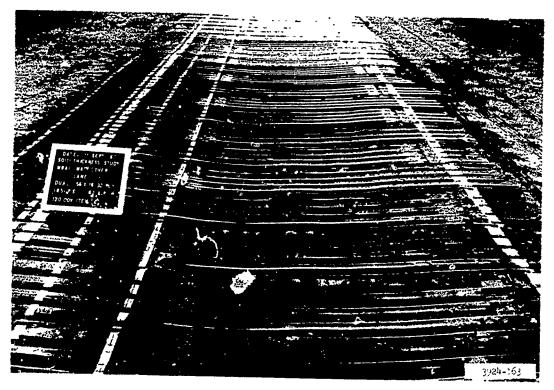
Test section I, lane 2, item 4, prior to traffic
